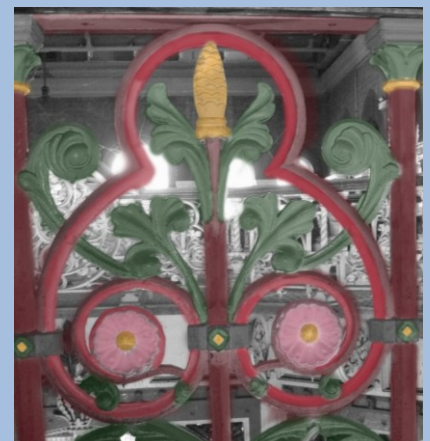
Dull Pink and Pink on 1st Floor Balustrade
